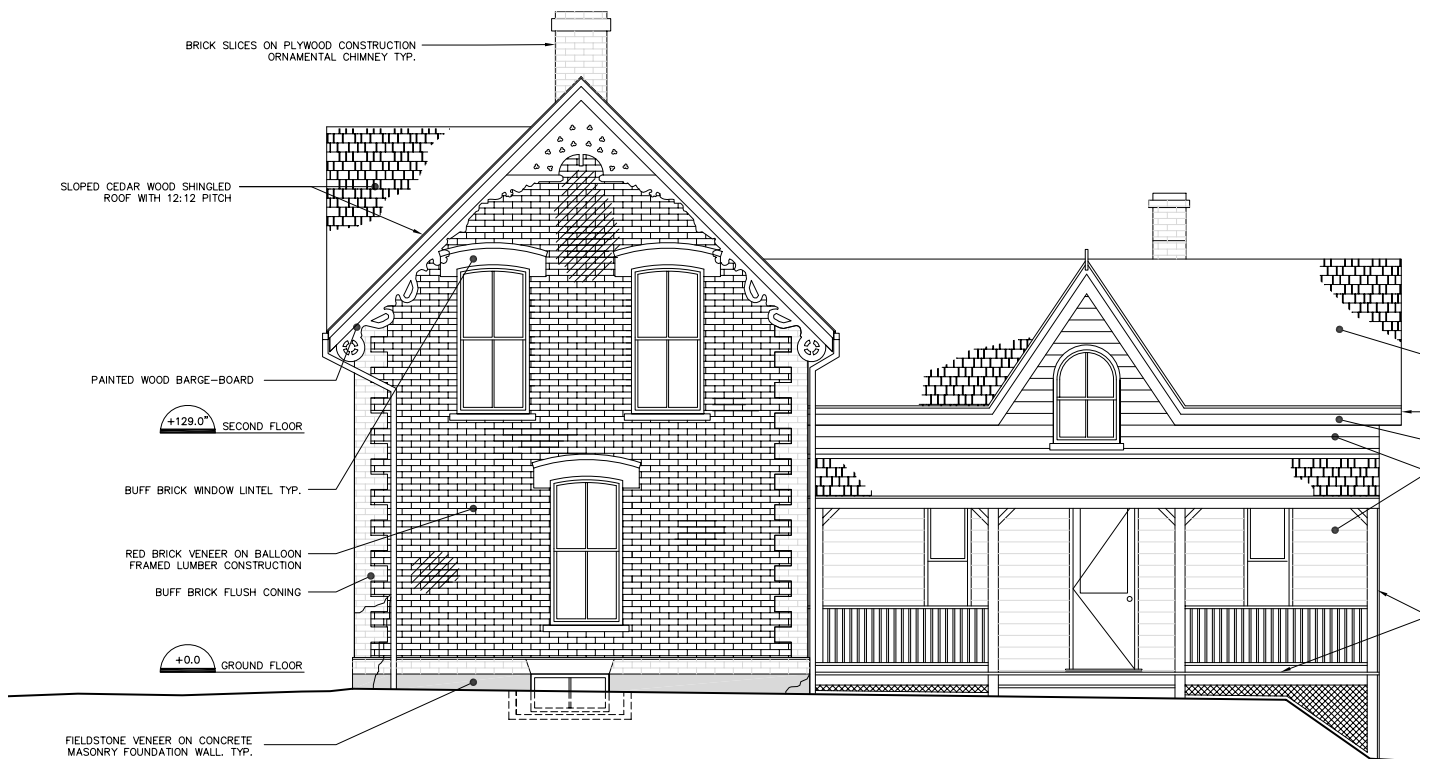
Britannia Farmhouse. North Elevation. 2009..
